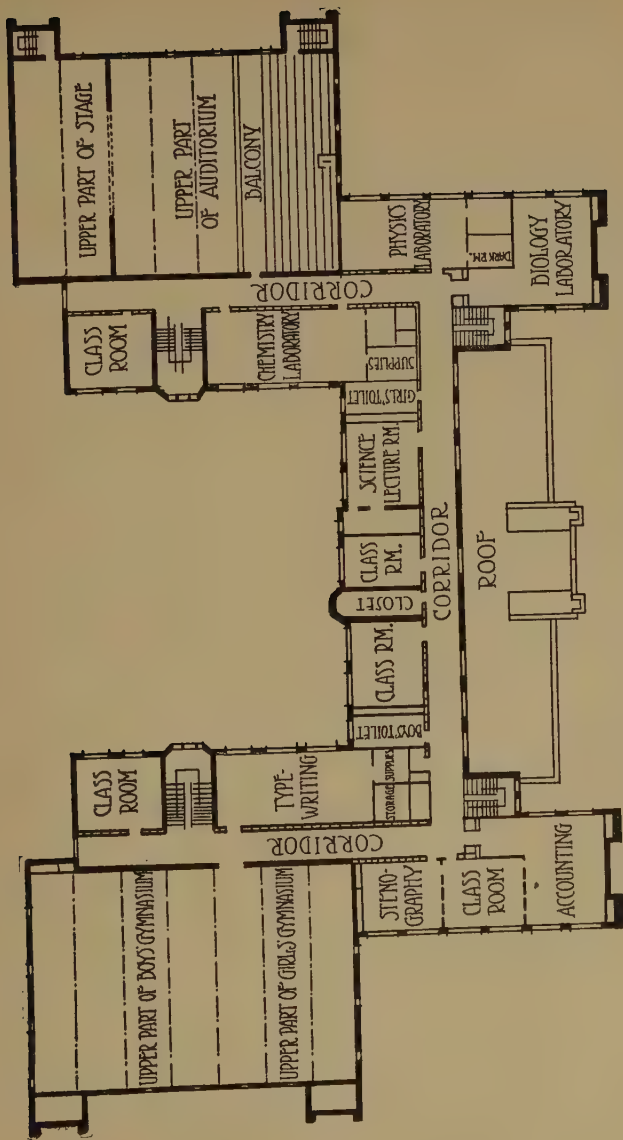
Second-floor plan of the senior high school, Dubuque, Iowa
